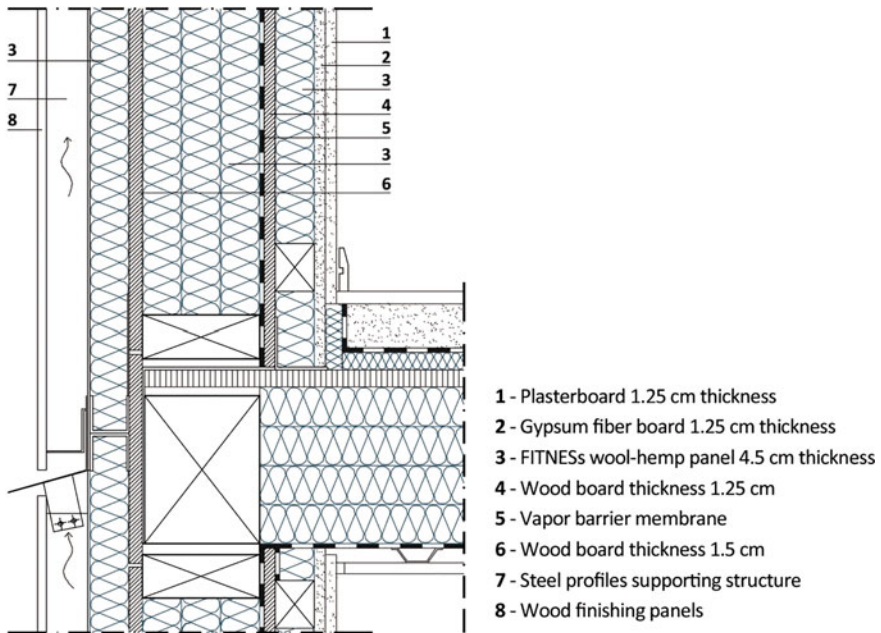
Ventilated Wooden frame wall stratigraphy, dry assembled using FITNESs panels as insulating infill and coating
